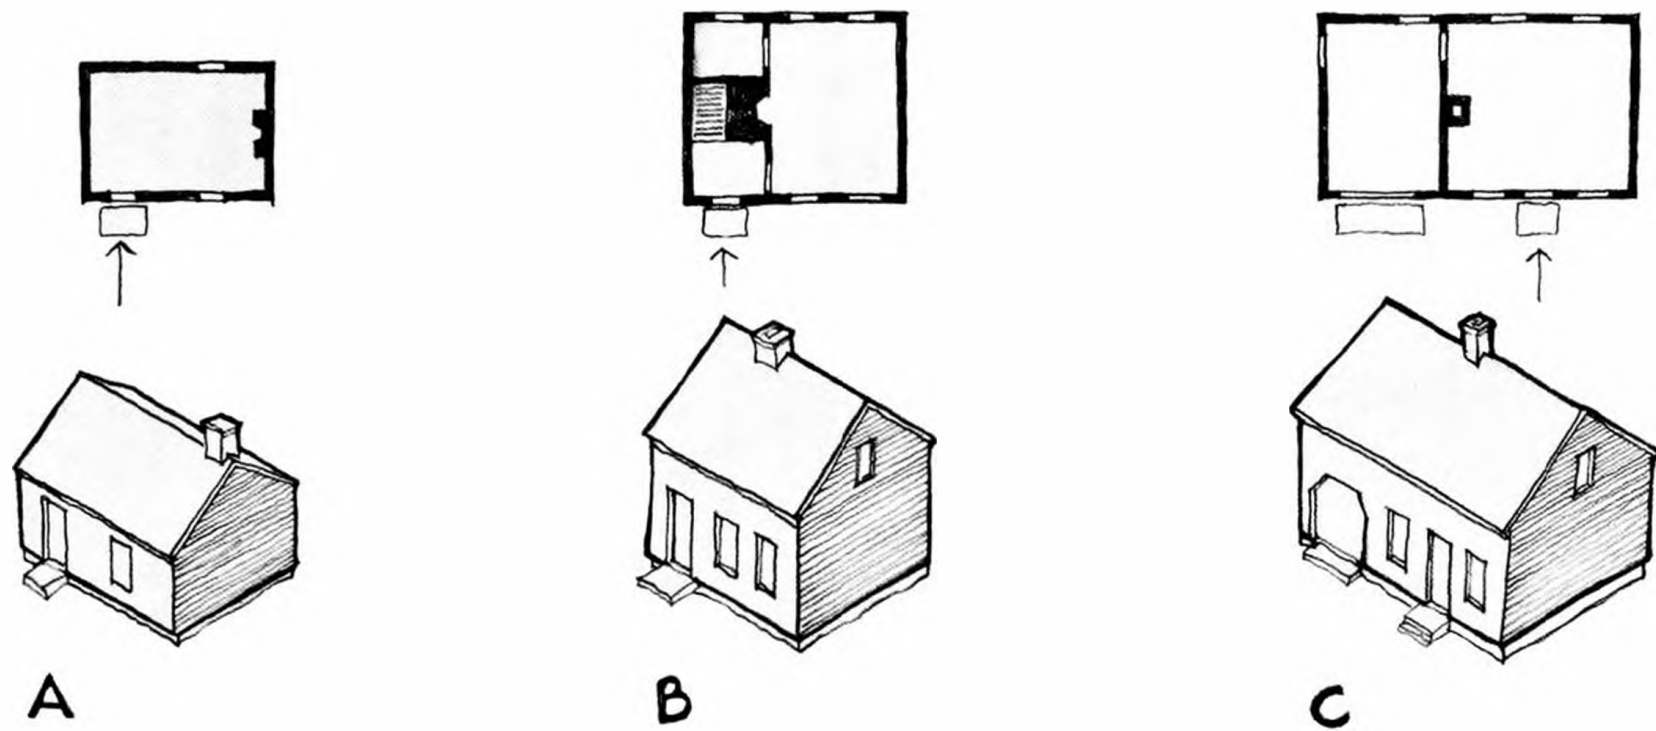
Common "little house" forms or kitchen ells in the connected farm arrangement: (A) one room type; (B) $1\frac{3}{4}$ story, room and hall type; and (C) kitchen ell built for the connected farmstead plan after 1850.
